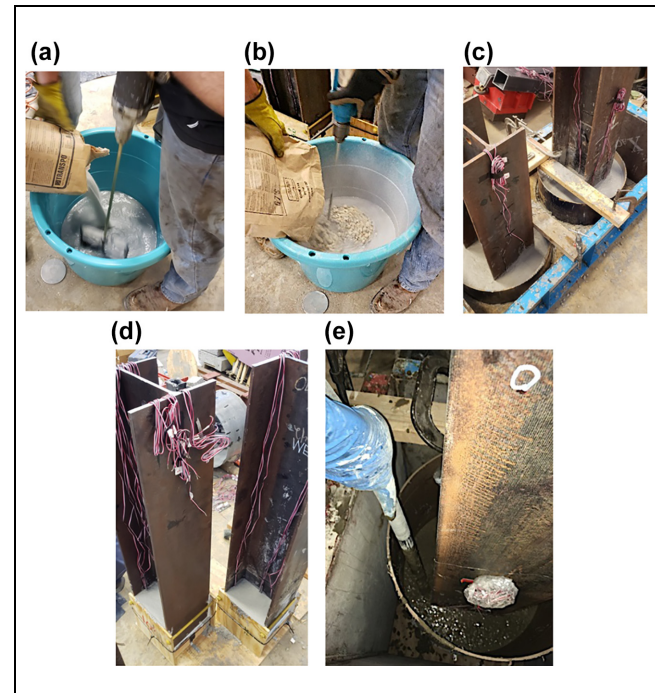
Concrete encasement placing: (a) placing the hardener and resin, (b) adding the aggregate, (c and d) placing the MMA-PC concrete in cylindrical and prismatic shapes, and (e) placing and vibrating the conventional concrete (CC).
